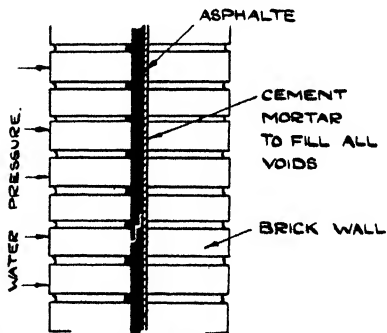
TREATMENT OF BRICK WALL BUILT AGAINST ASPHALTE
